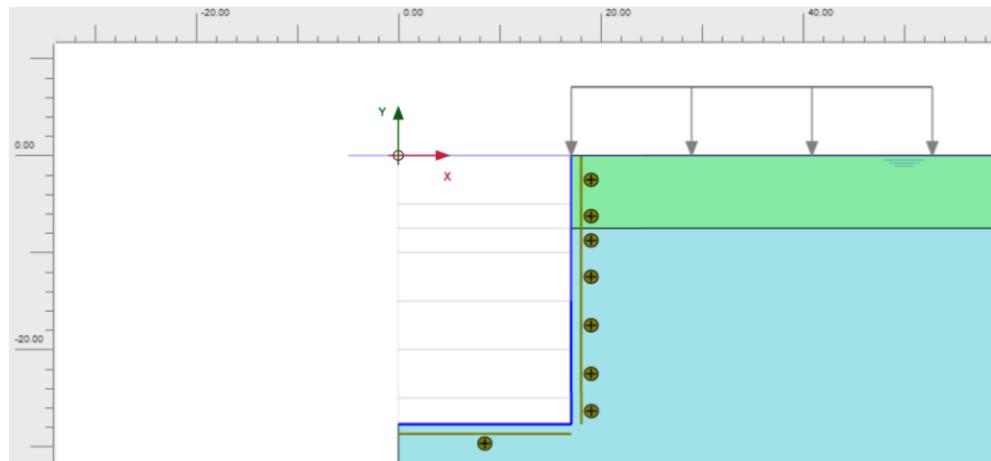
Plaxis asymmetric model of the secant piles with shotcrete.
